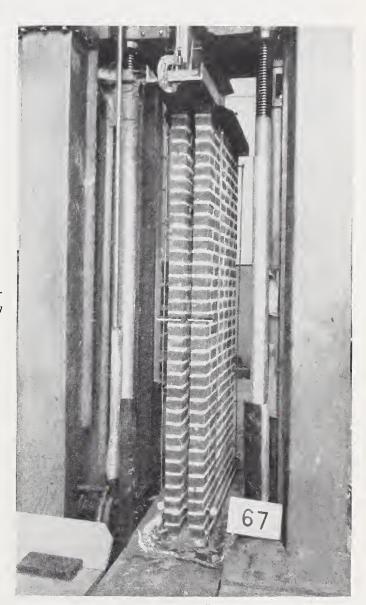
Wall specimen BD-C2 under compressive load, load applied to both facing and backing.
